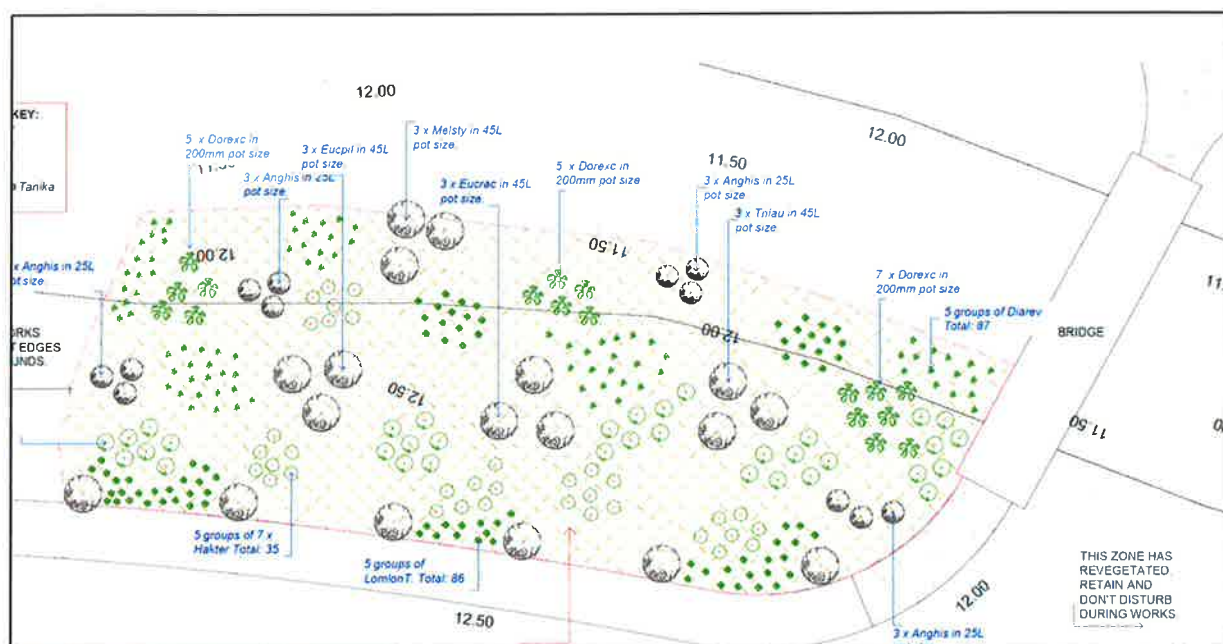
| Proposed landscape plan showing detailed plantings (source: Mod 7 application documents)
